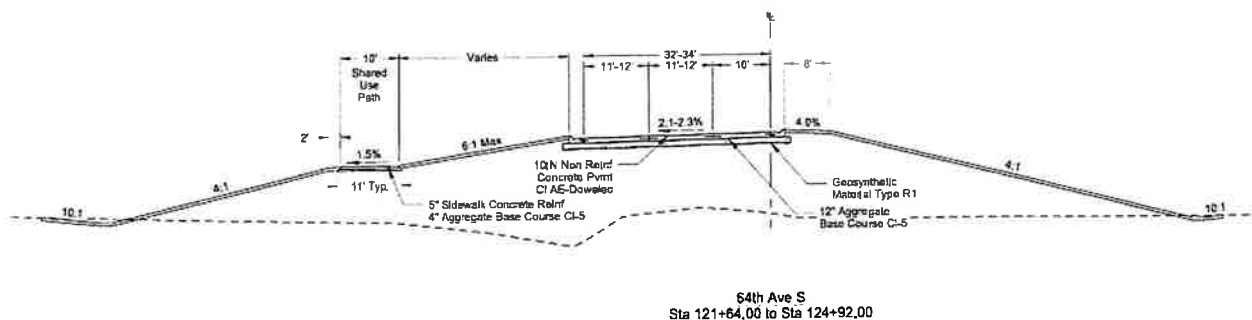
64th Avenue S, West of Bridge, Existing Typical Section
